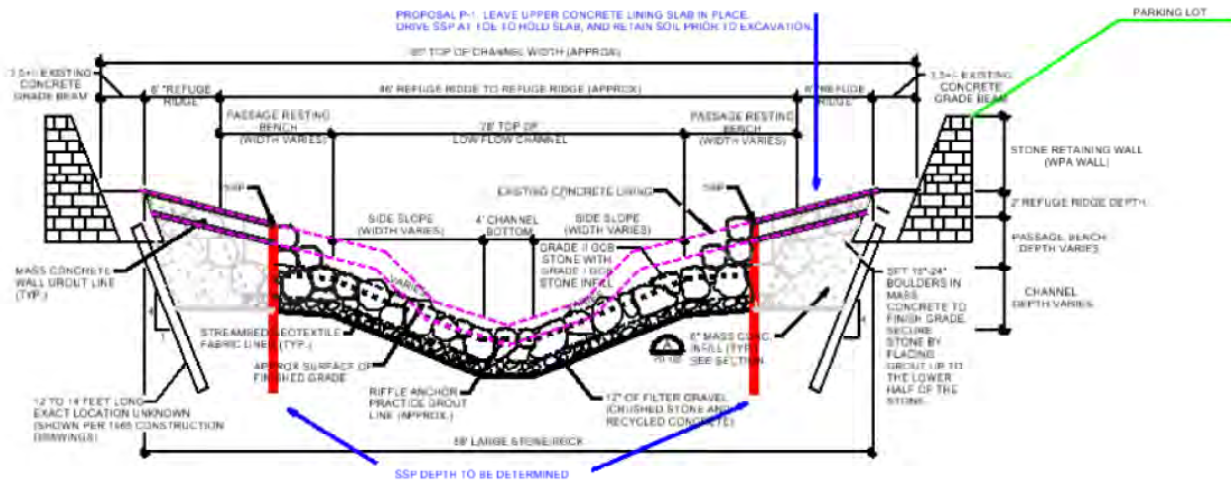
VE Proposal to Stabilize Slope Behind WPA Wall
